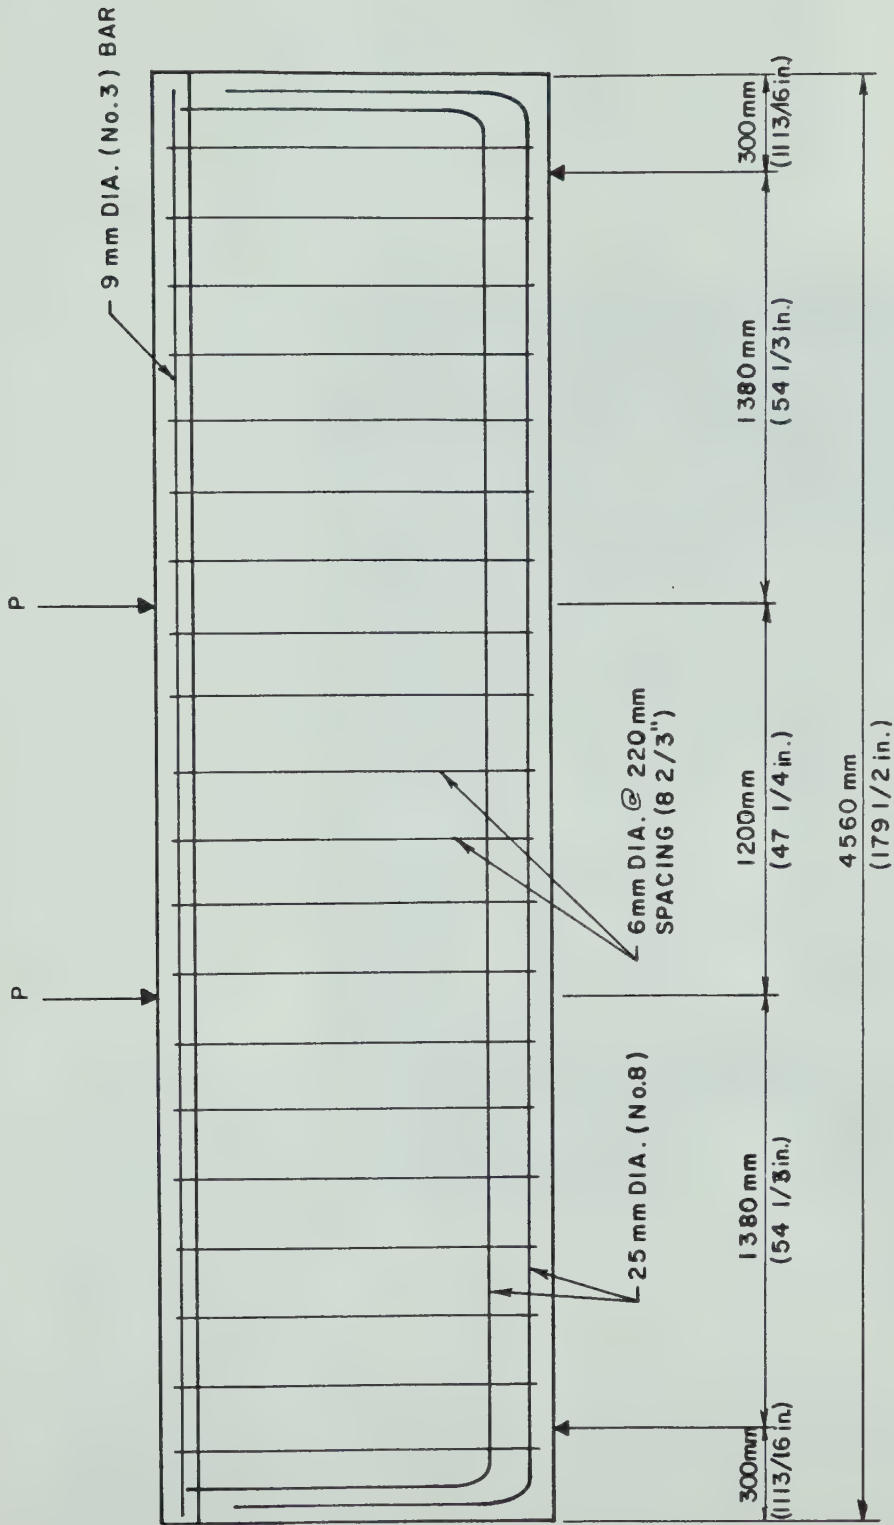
Beam Elevation Showing Reinforcement Layout with Conventional 6 mm Diameter Stirrups (Not to Scale)
